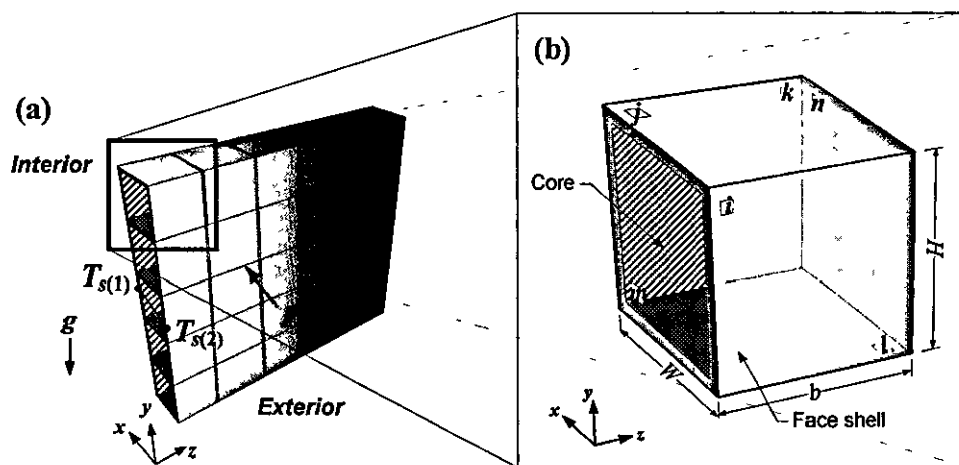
Idealised unit cell CMU wall structure. (a) Wall structure consisting of an assembly of discrete cubic structures, (b) enlarged view of a unit cell cube. (P denotes pressure loads)
